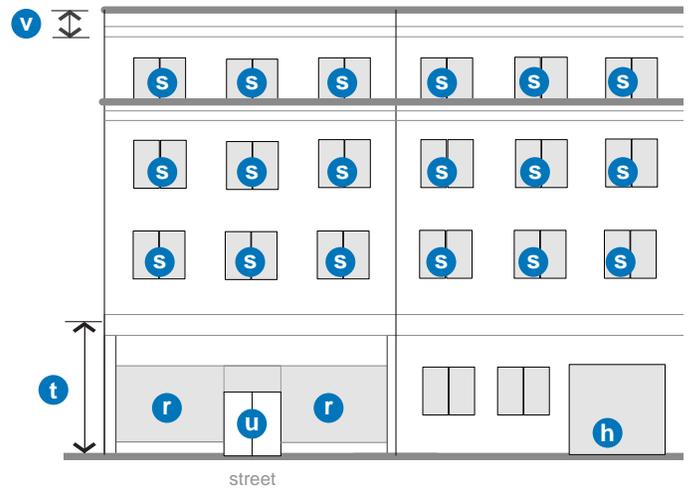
(3). Limited Bay Building: Street Façade Requirements.
